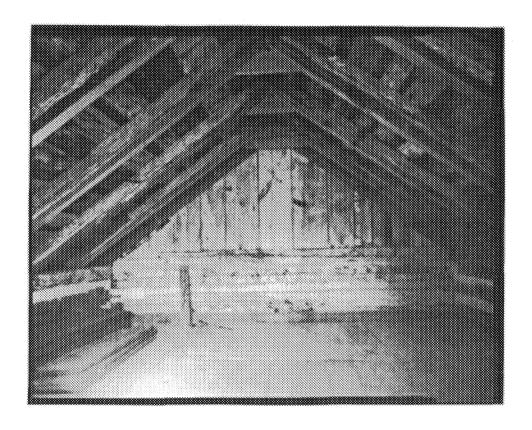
Hampton Quarter 1, attic: view of southeast gable end wall, looking southeast.
